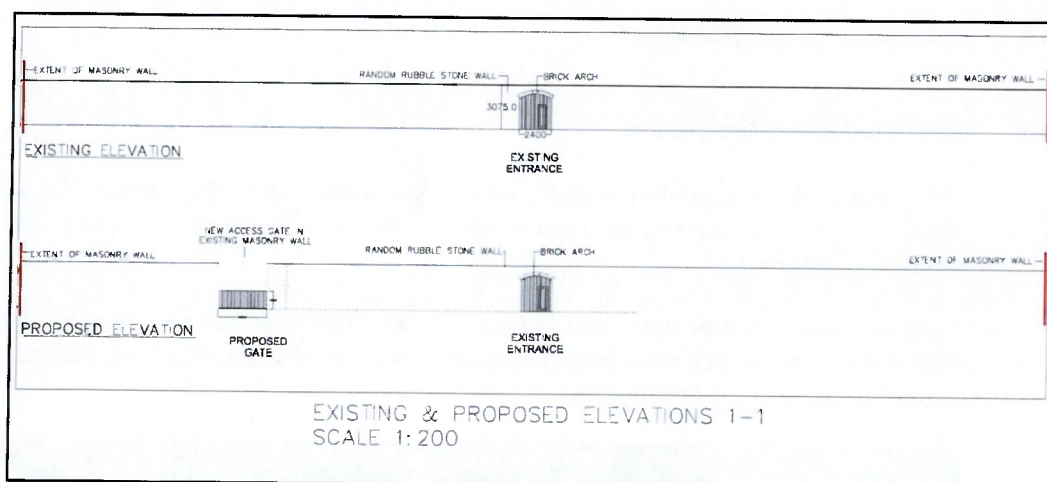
Existing and proposed elevations of stone wall. (Source: Eugene Keyes c/o Bishop's House, Carlow).
